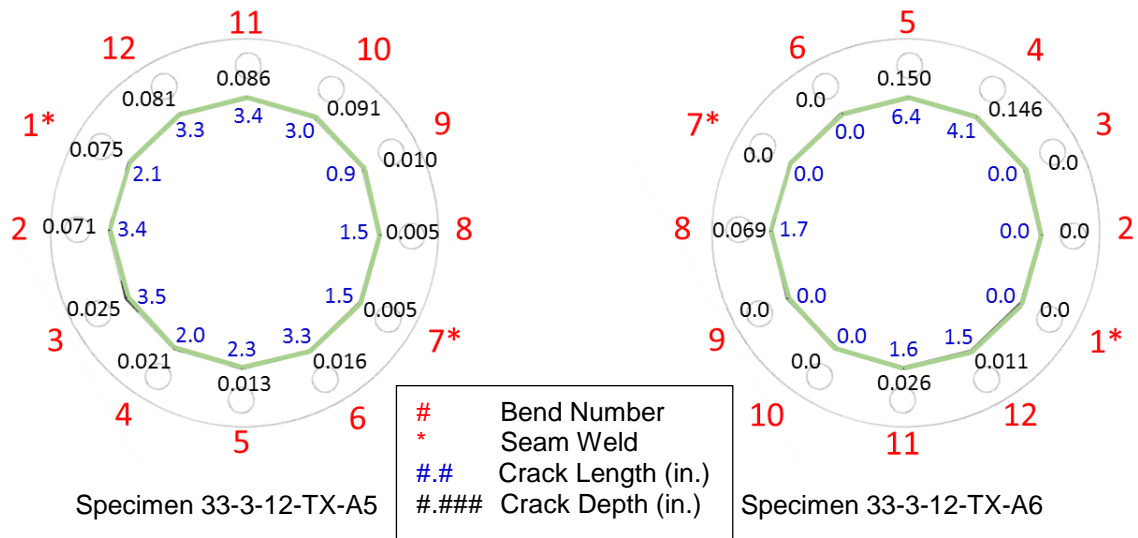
Specimens 33-3-12-TX-A5 and 33-3-12-TX-A6: Cracks after 79.2 Million Fatigue Cycles
